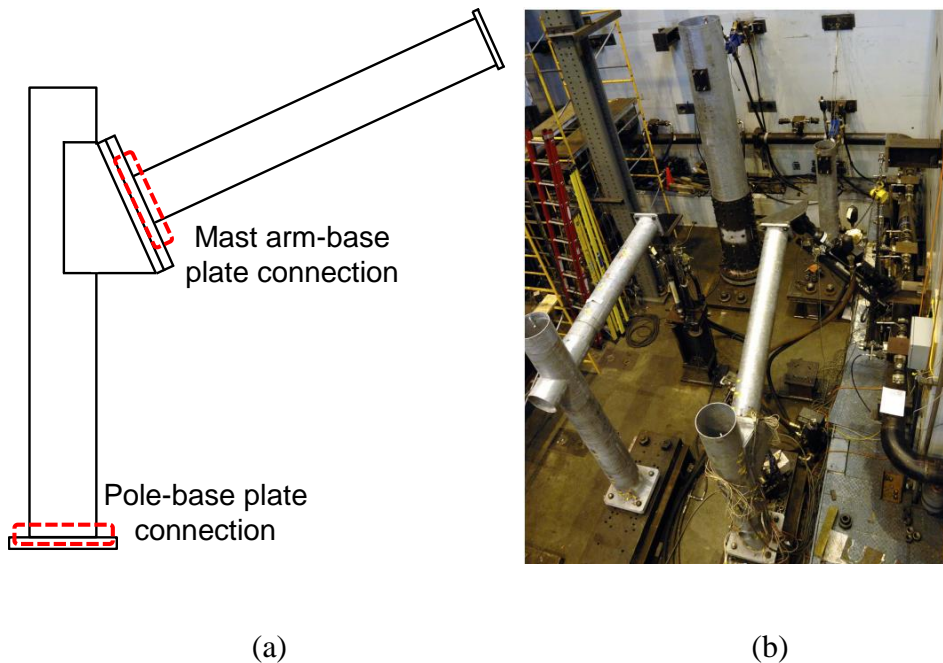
Specimen of fatigue tests: (a) investigated fatigue details; and (b) test setups (Roy et al., 2011)
